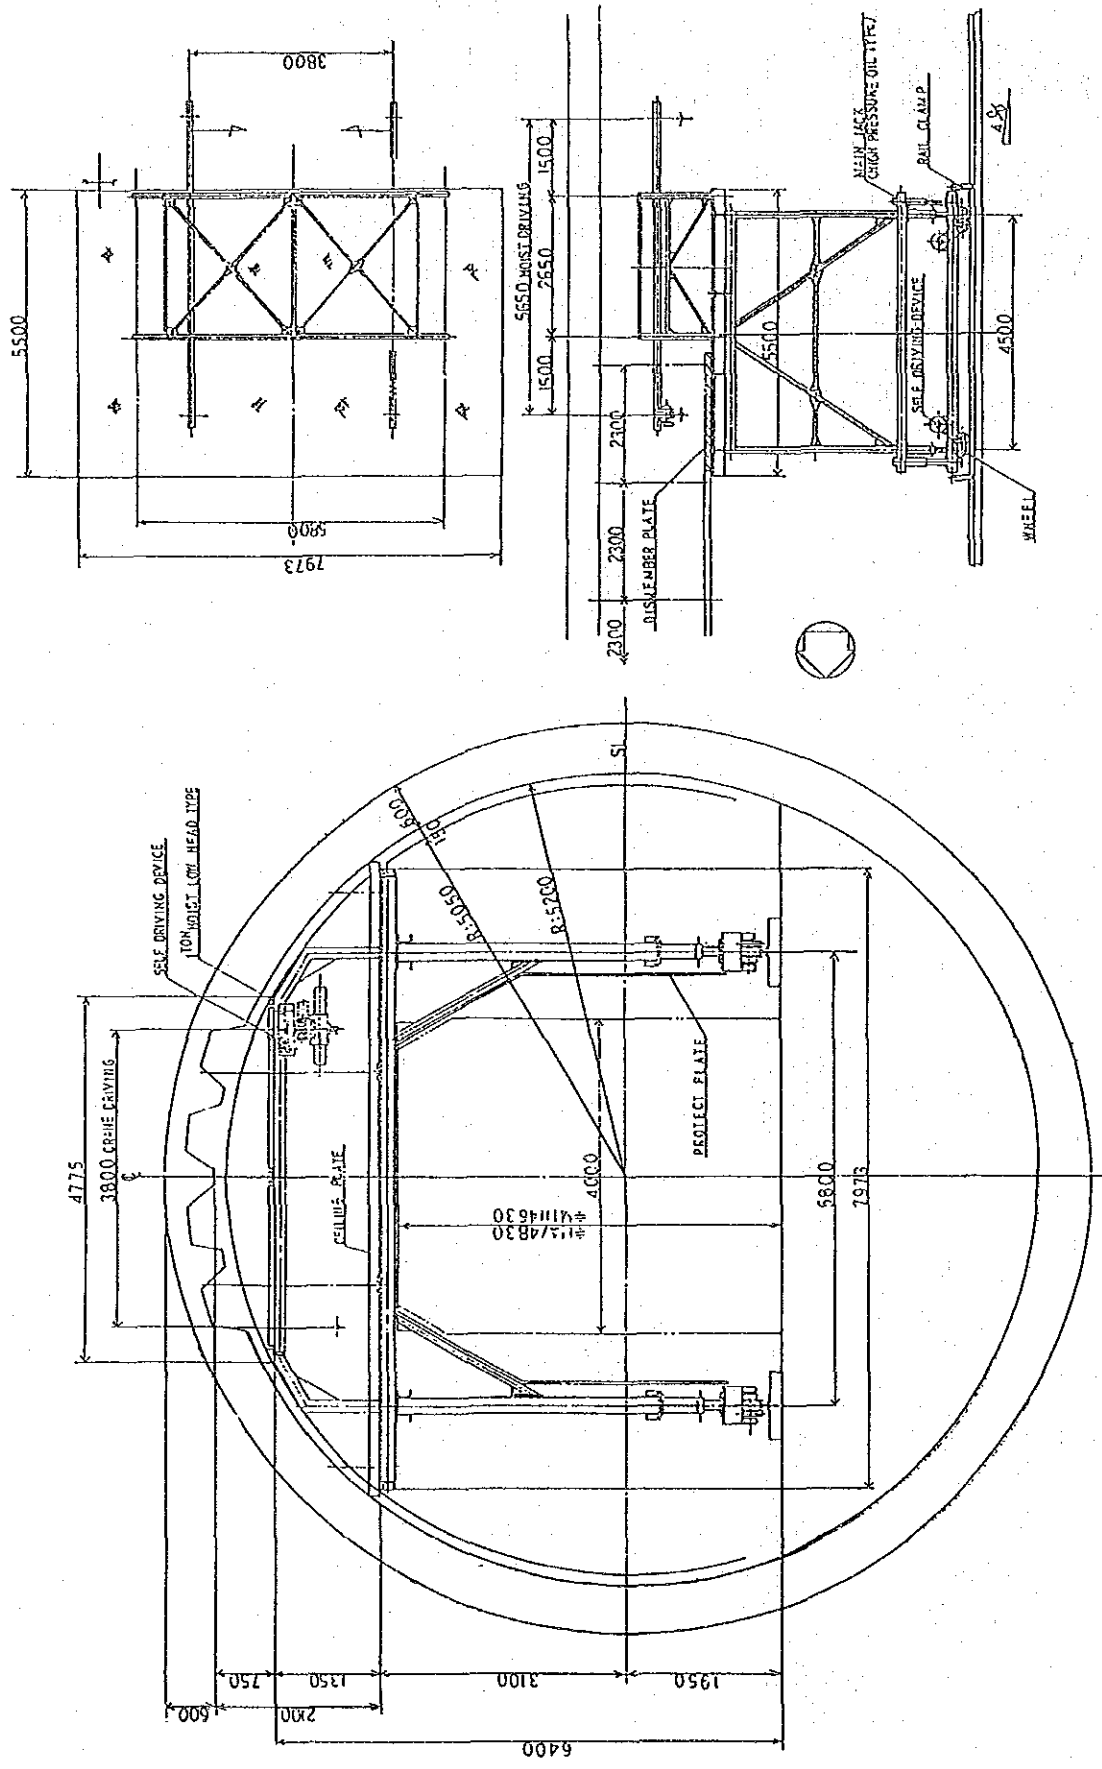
Scaffolding Wheels for Dismantlement/Installation of Ceiling Panels
